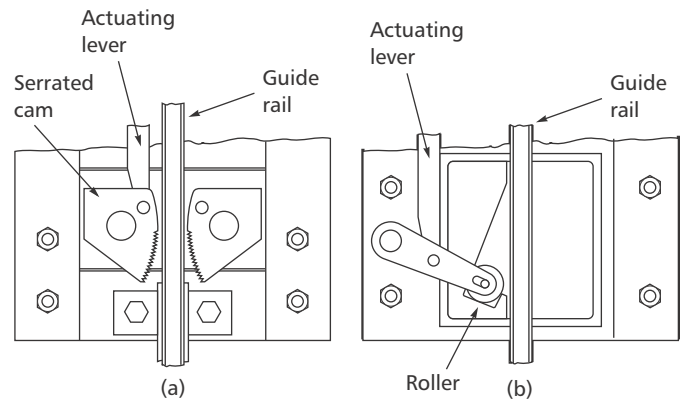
Instantaneous safety gear; (a) serrated cam, (b) roller type
